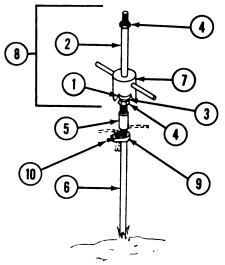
Slide Hammer Assembly (Installing Ground Rod)
